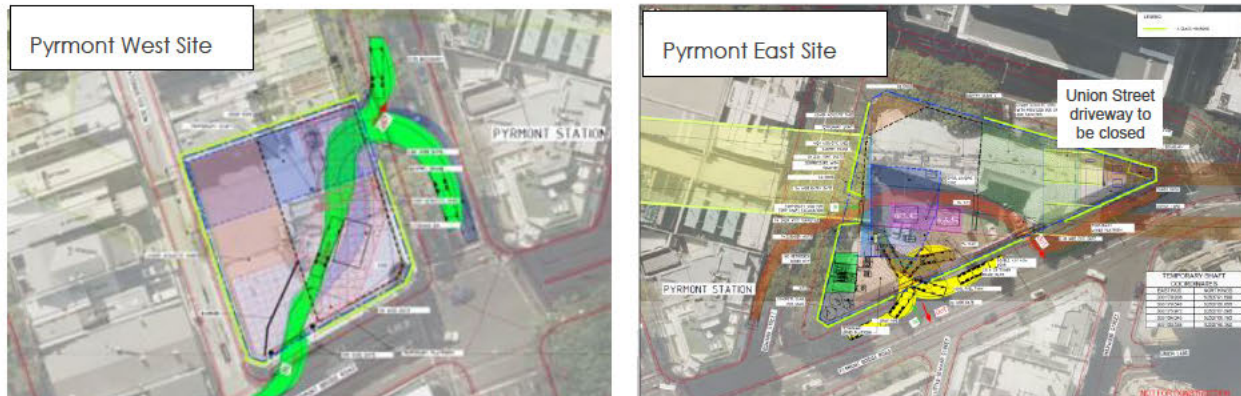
Proposed Pyrmont East and West Construction Site Access Locations
